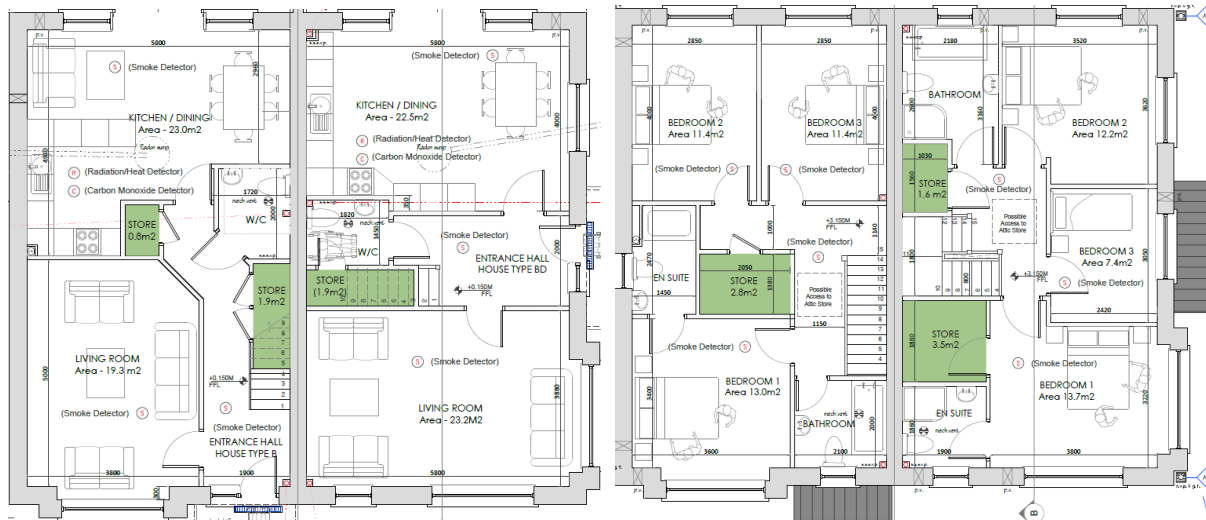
Typical ground floor plan of House Type B and House Type BD, respectively (left) and typical first floor plan of House Type B and House Type D, respectively (right)
